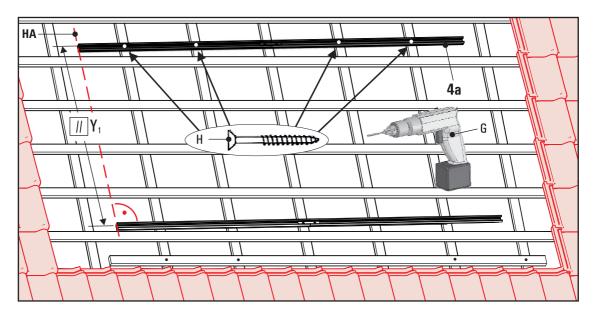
Set up upper mounting rails (4a) parallel to the lower mounting rails and fix with particle board screws (H) on the rafters.
